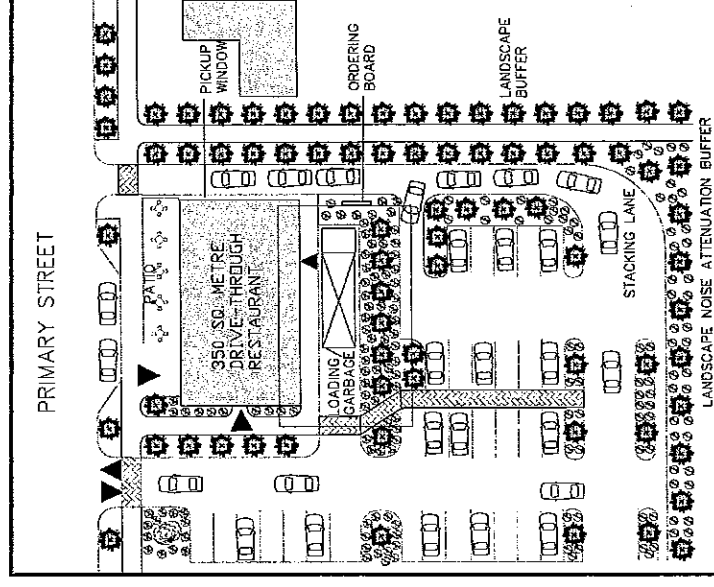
Garbage and loading should be located to the rear of buildings, screened with planting and architecturally integrated
